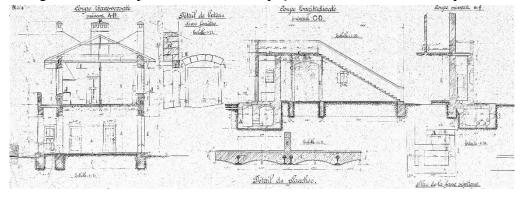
Project drawn for Fevzipaşa / Cross section and details
